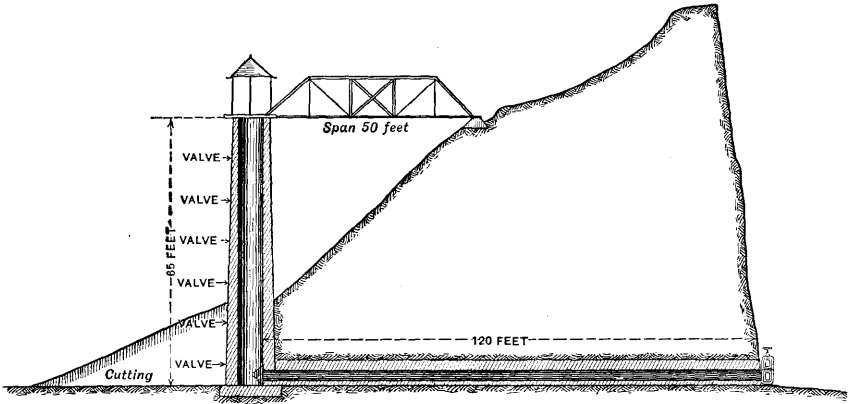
Outlet of tunnel, rock-filled dam, East Park dam site.
